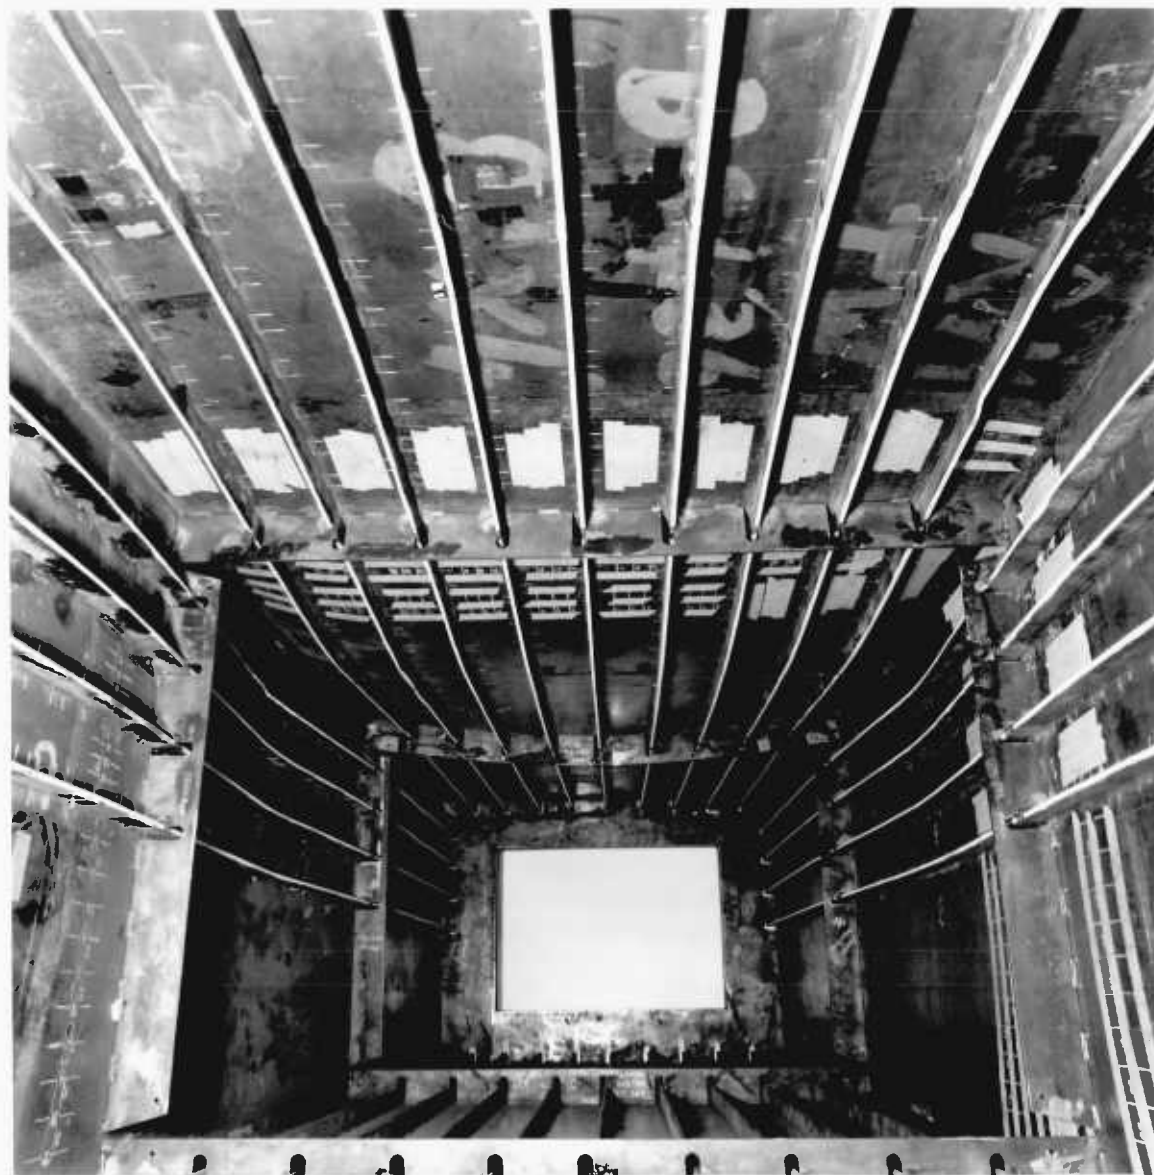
Model 8 - showing the inside of the model (from end M) after failure. The compression flange is at the top of the picture.
